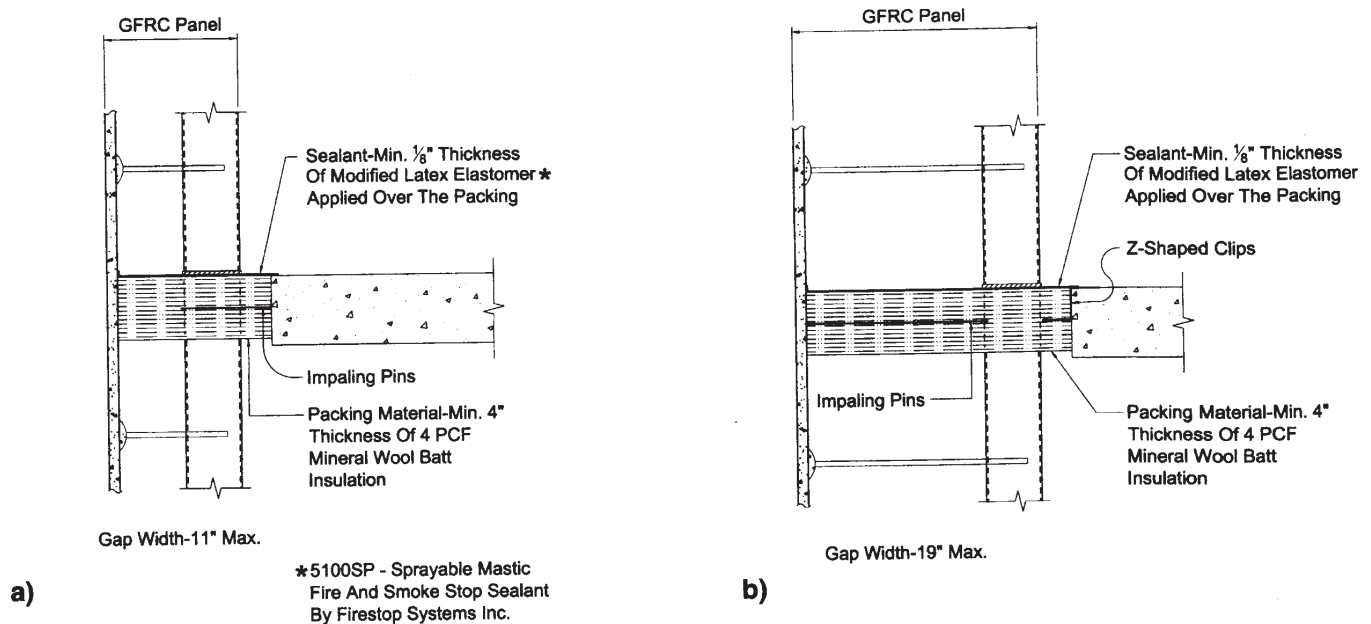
Fire-safing details. (Taken from Glass Fiber Reinforced Concrete Panels, Fourth Edition, PCI. Used with permission, Precast/Prestressed Concrete Institute.)
